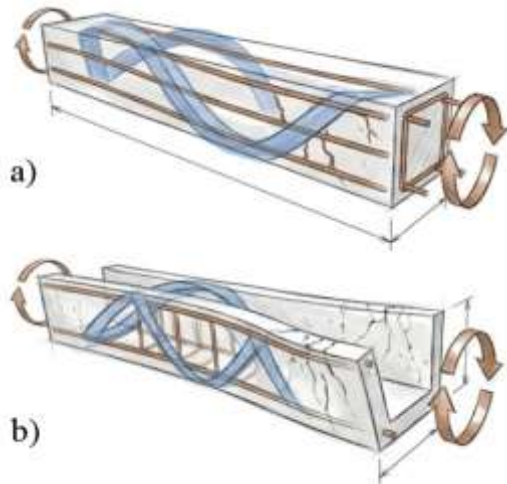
Engineering deconstruction of the work of a reinforced concrete cross-section in torsion.
